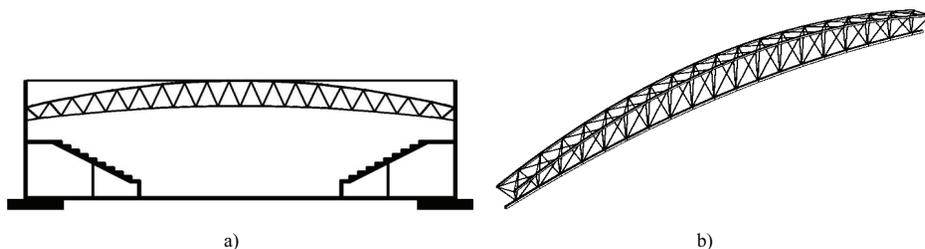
a) Cross-section through the considered steel hall, b) the view of the spatial truss girder.
